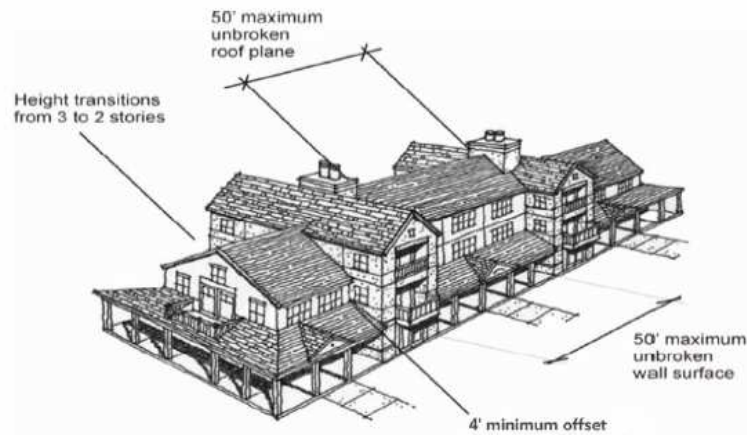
All buildings shall be designed to provide complex massing configurations with a variety of different wall planes and roof planes. Plain, monolithic structures with long, monotonous, unbroken wall and roof plane surfaces of fifty feet (50') or more are prohibited.
